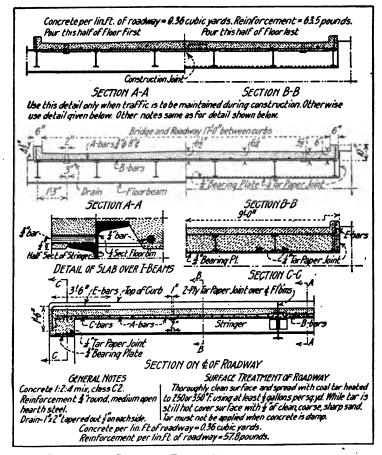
REINFORCED CONCRETE FLOOR, MICHIGAN HIGHWAY COMMISSION.
